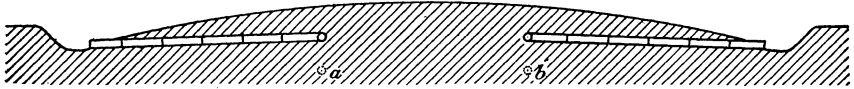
Cross section of underdrained road. If lower outlets can be secured subdrains may be placed as at *a* and *b*, or directly under side ditches.
